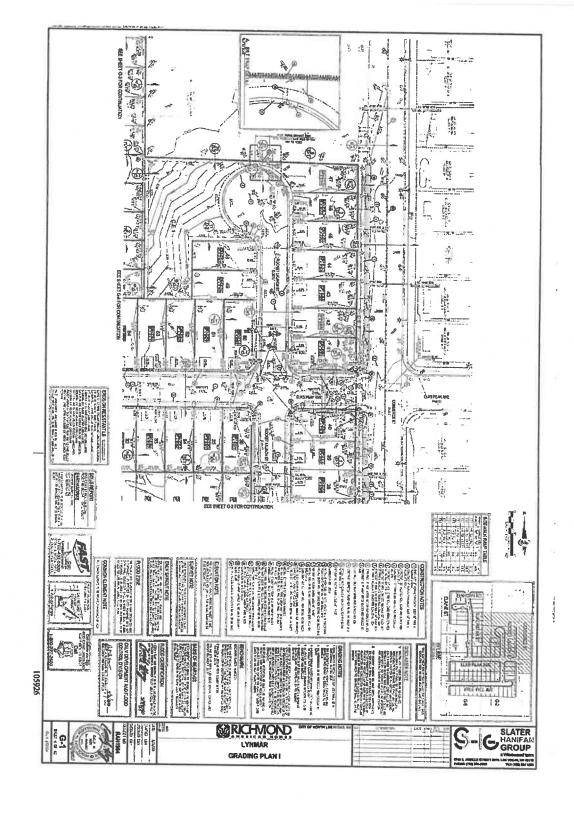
# EXHIBIT "A" CIVIL IMPROVEMENT PLANS
